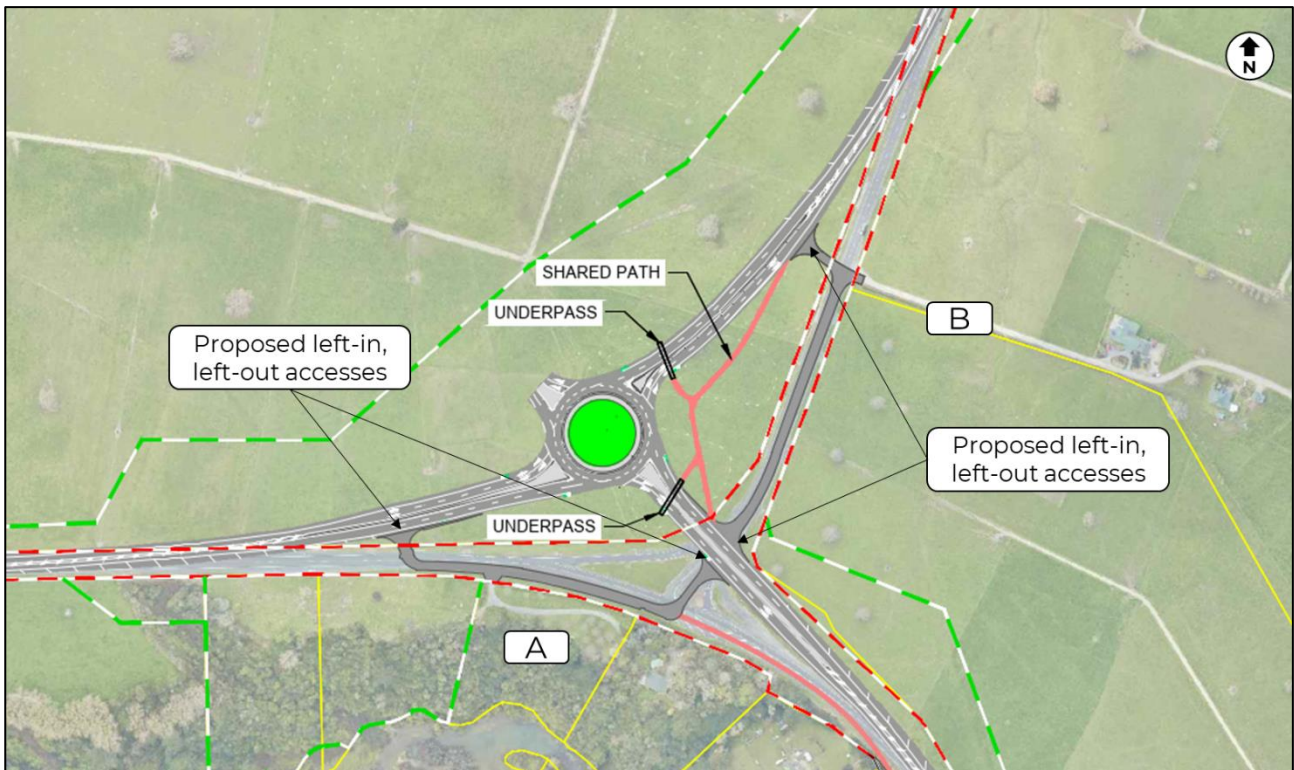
Proposed access layout for Access A and Access B²⁷
